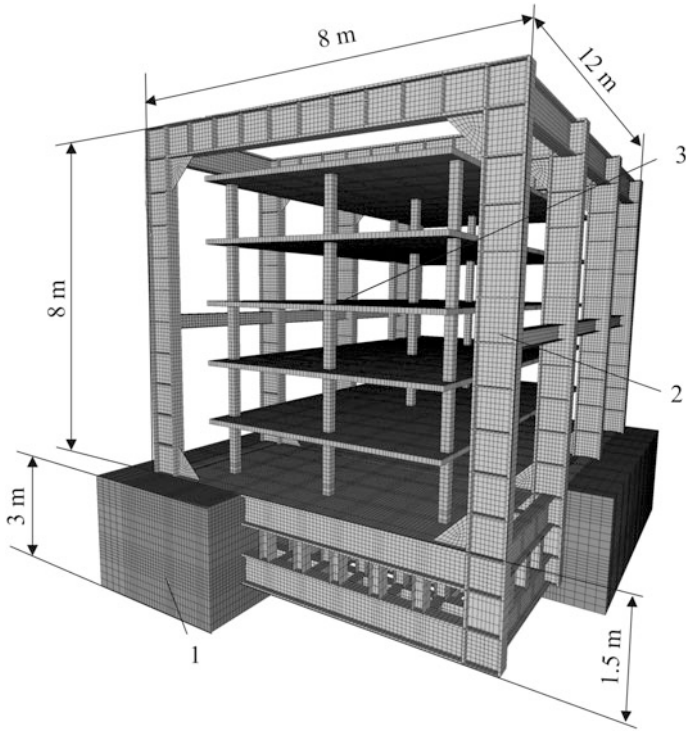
Test stand with scale model of the structure: 1—reinforced concrete foundation, 2—force loop, 3—scale model of building
